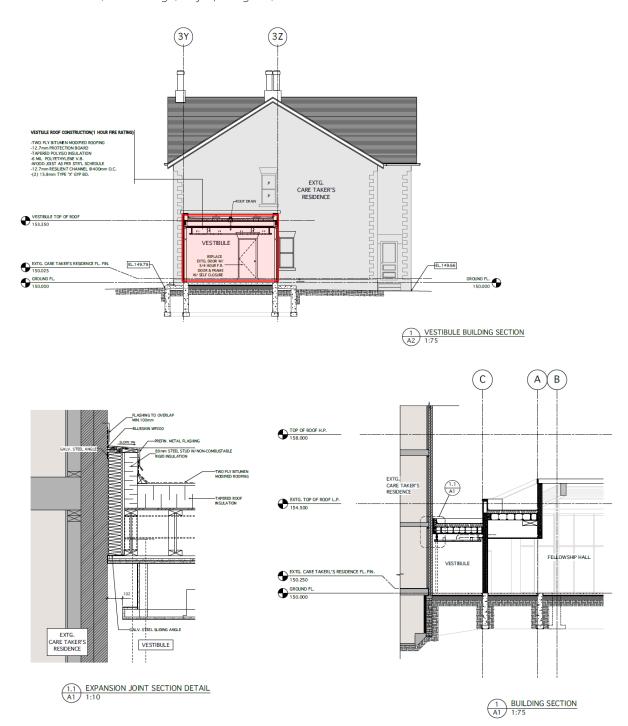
Proposed site plan (C.Y. Lee Architect Inc, 2019.) Architectural drawing of proposed development; existing care taker's residence represents the heritage building; red box indicates vestibule between new addition and heritage building (C.Y. Lee Architect Inc., 2019)
